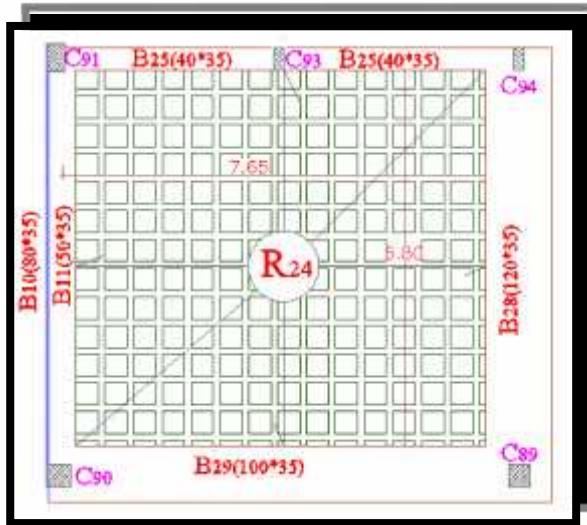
Two Way Ribbed Slab with 35 cm Thickness.
